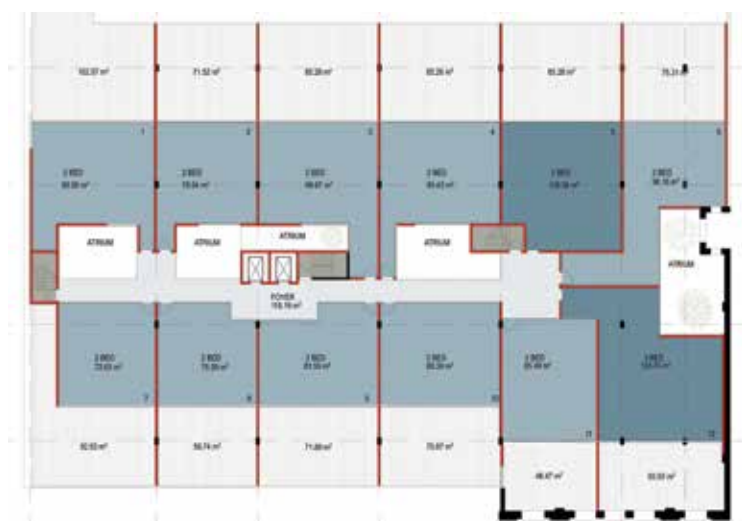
Bolton Street carpark - proposed typical residential floor (TZG 2012)
